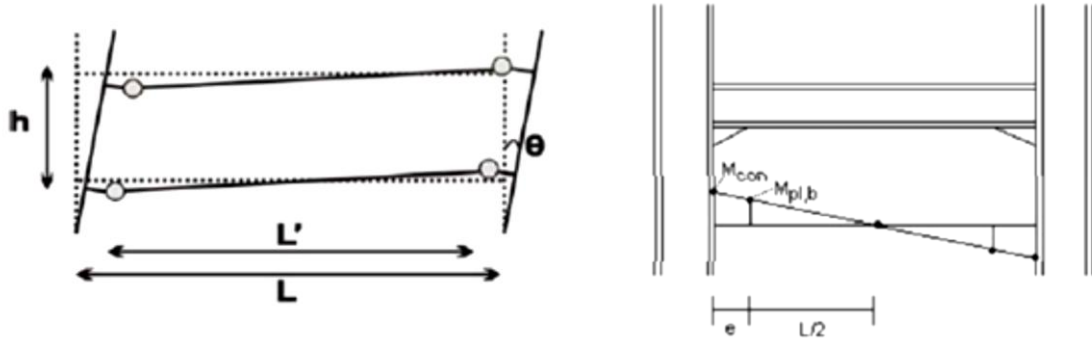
Plastic hinges with RBS sections and end strengthening of the beam
